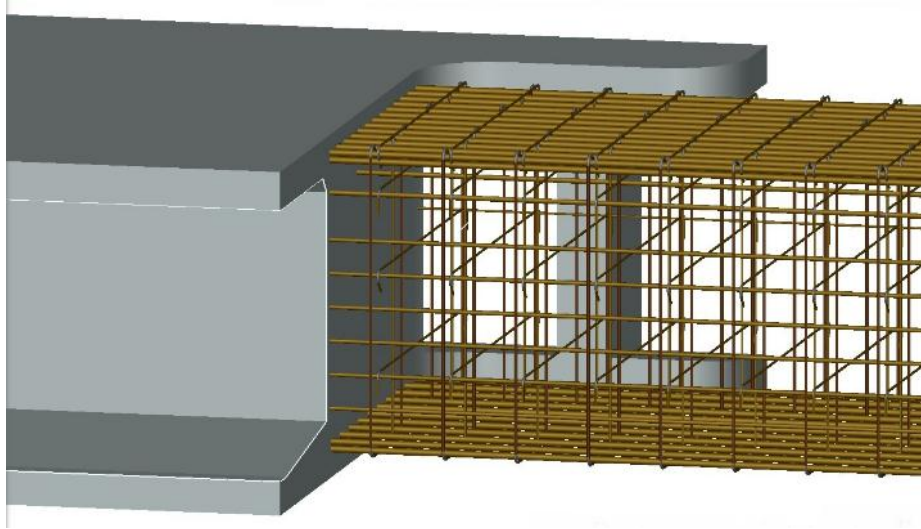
Bent Cap Reinforcement of Integral Bent Cap
